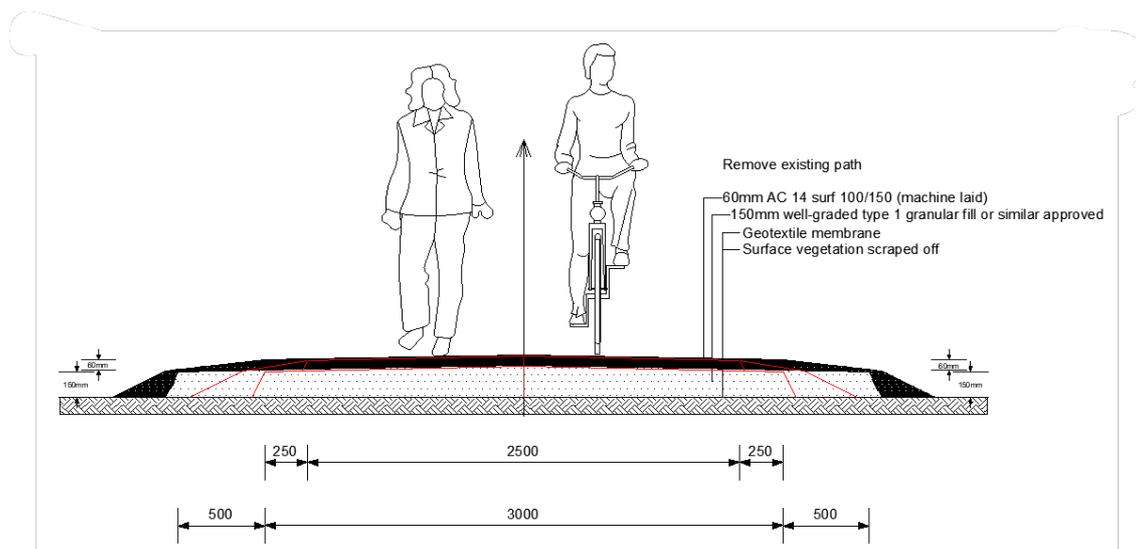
Typical standard construction detail (outer dimensions indicate typical widening approach)
